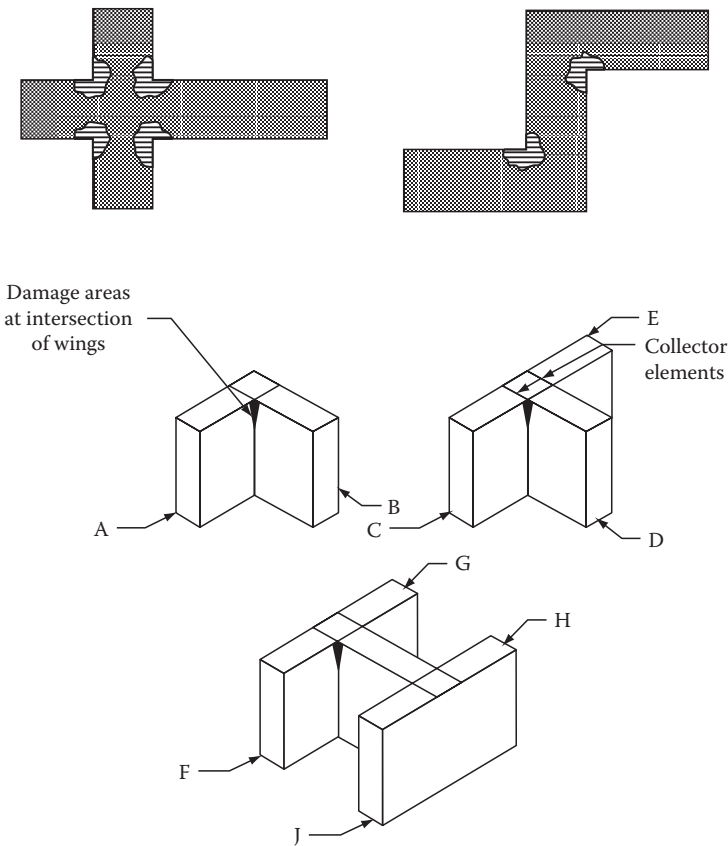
Reentrant corners in L-, T-, and H-shaped buildings (as a solution, add collector elements and/or stiffen end walls A, B, C, D, E, F, G, and J).
